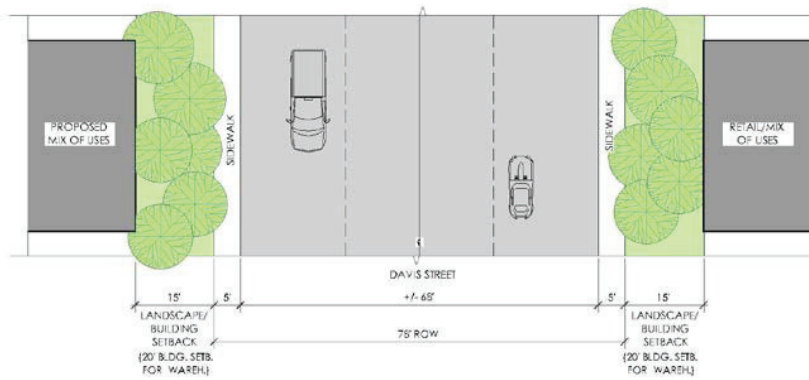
Hemlock Avenue and Davis Street Plan B
